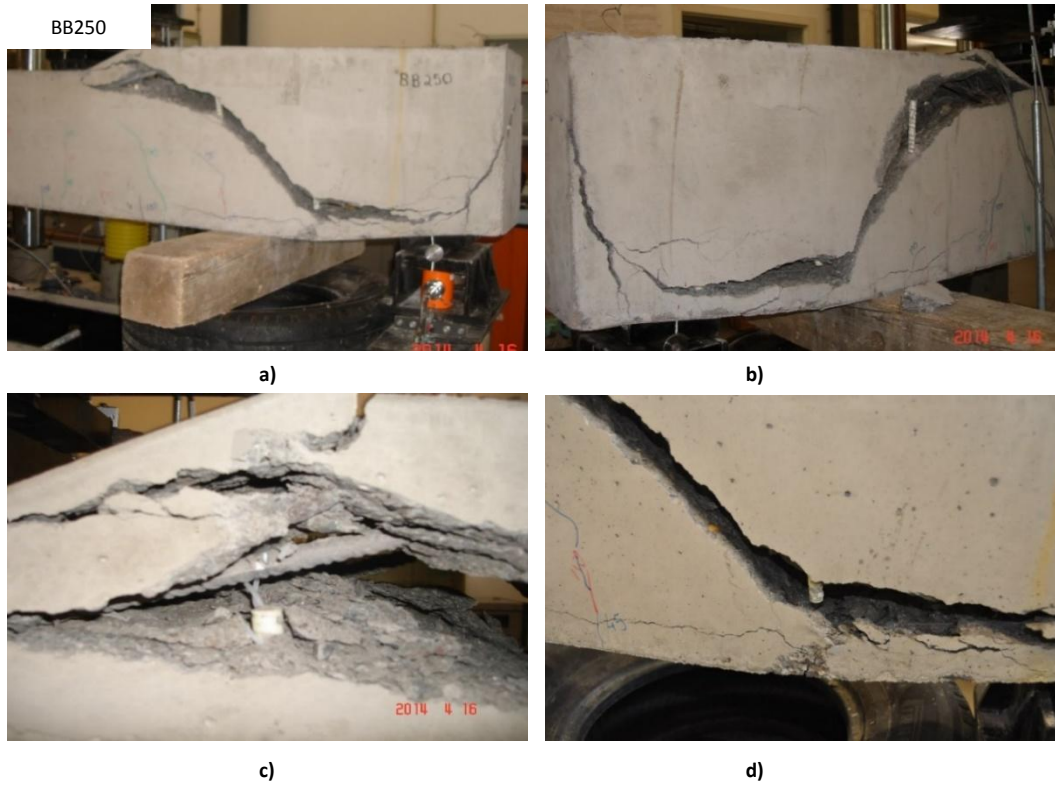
BB250 beam failure: a) overall view of one side of the support; b) overall view of the other side of the support; c) pull-out of the shear reinforcement in compression zone; d) pull out of the shear reinforcement in bottom zone
